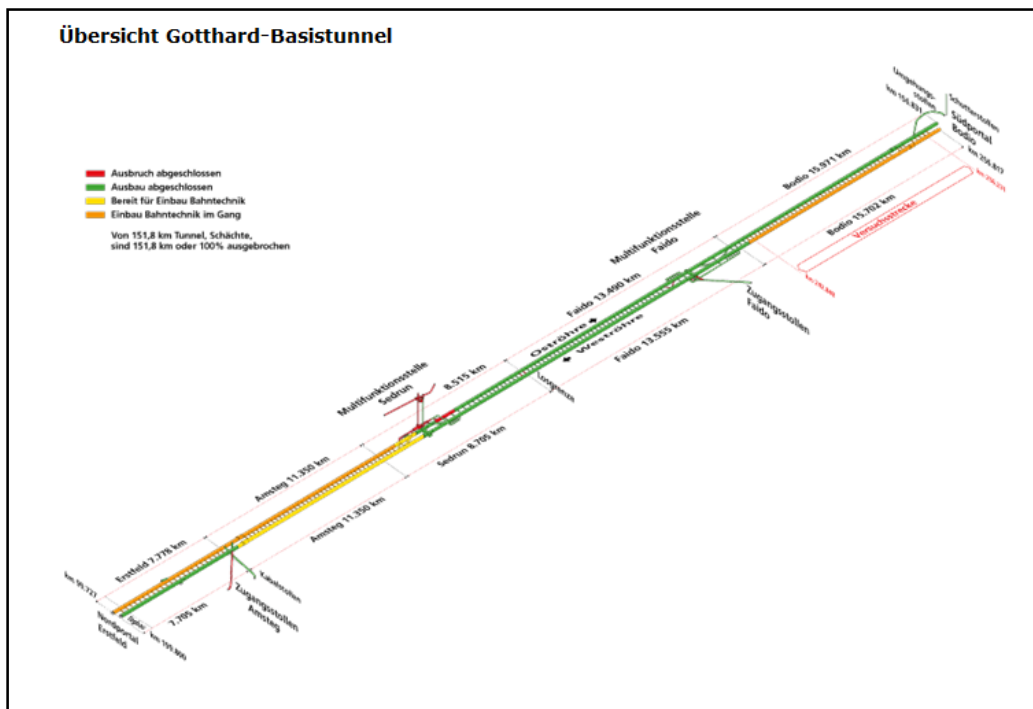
Drilling works at Gotthard base tunnel (31.12.11)
